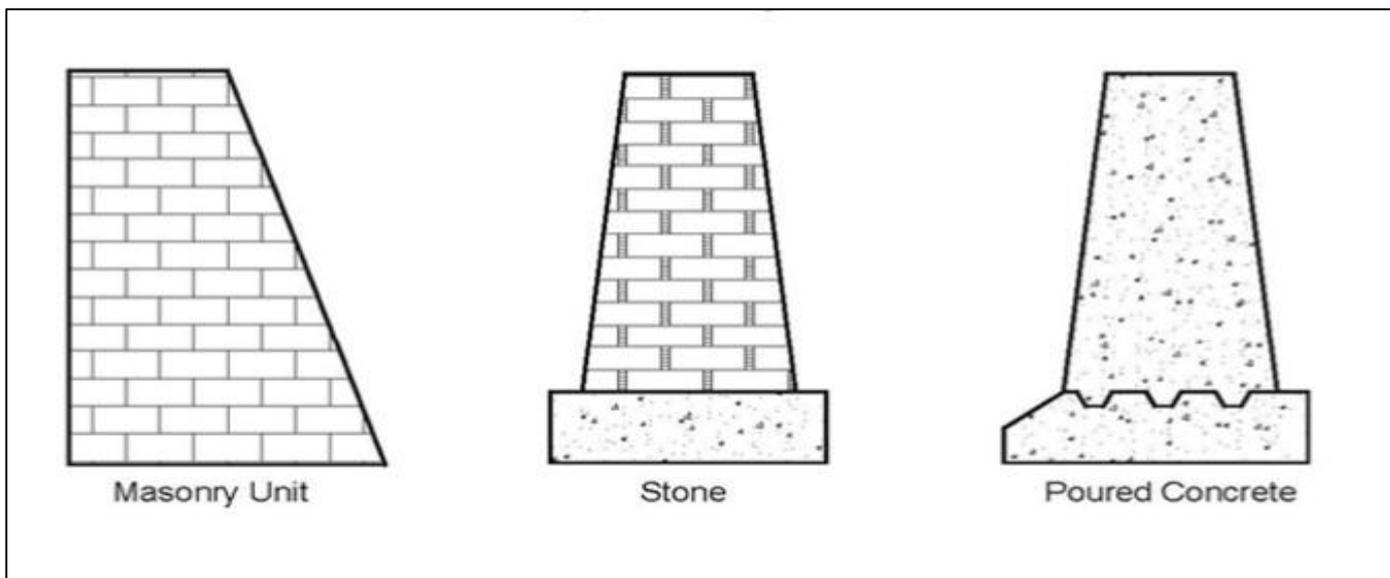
Gravity Retaining Wall from Masonry Unit, Stone or Mass in-Situ Concrete (Tensar Website)
